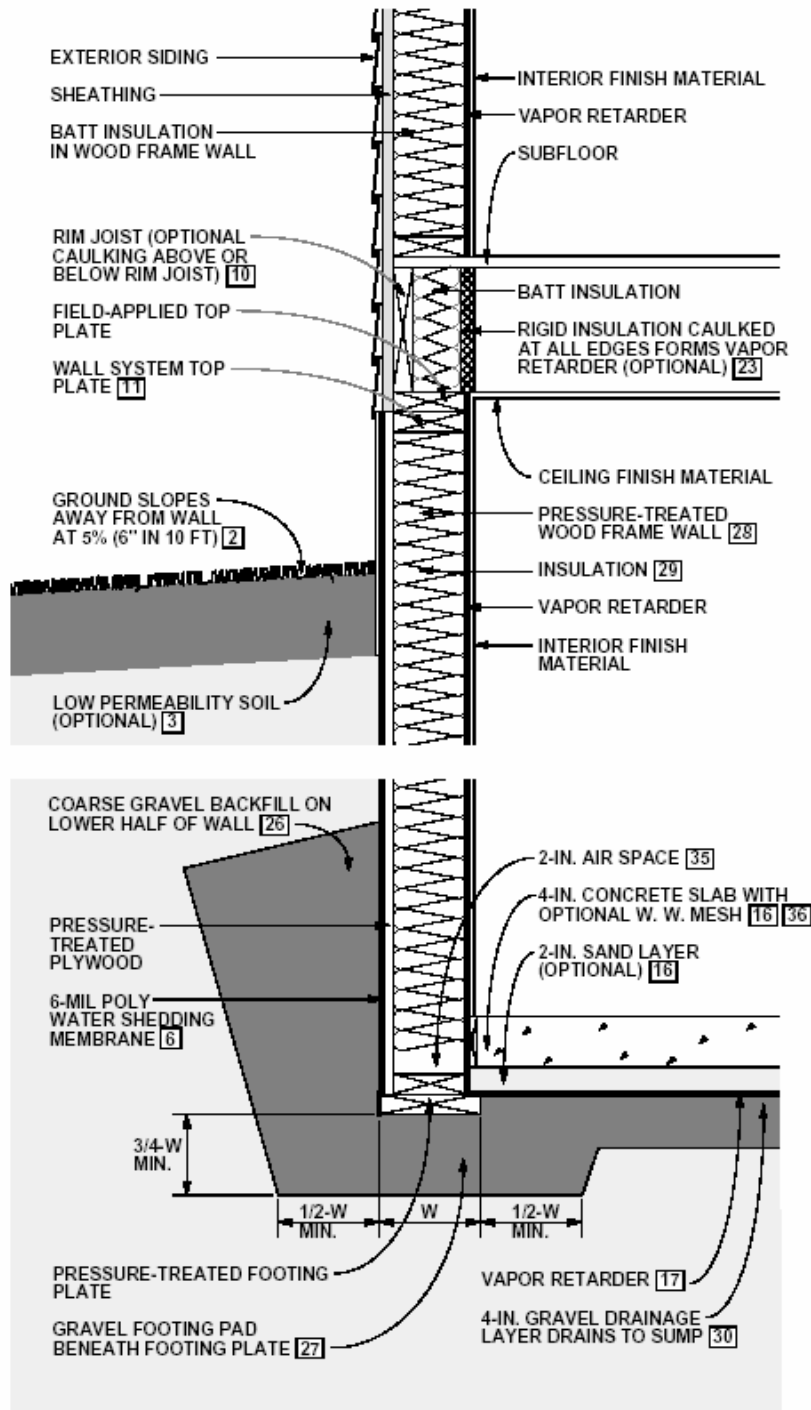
illustrates a pressure-preservative-treated wood foundation wall. Insulation is placed between the studs similar to a conventional wood frame wall.
